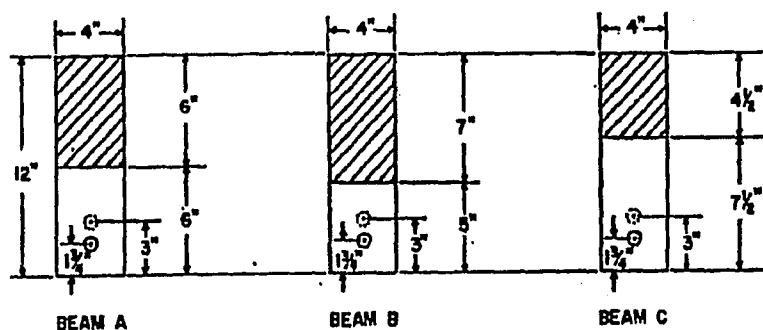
Cross-Section of Beam Tested by Bryson and Carpenter
